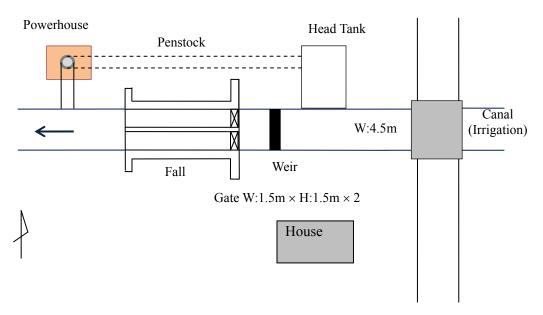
Power Facility Plan at Pakhtakor Site
